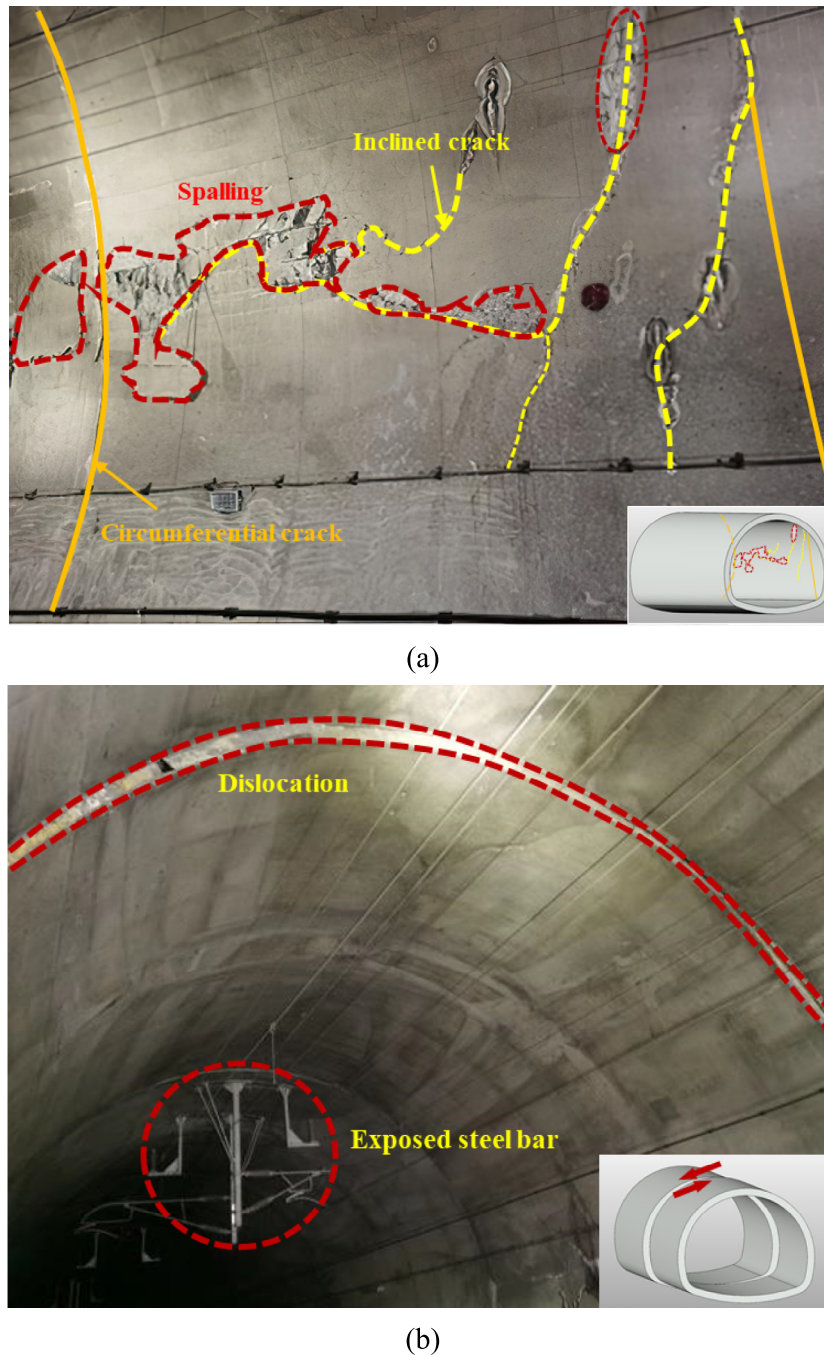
Site earthquake damage of the extensively damaged section of Daliang tunnel. (a) Construction joints exhibiting cracks and spalling, and (b) lining dislocations with exposed steel bar.
